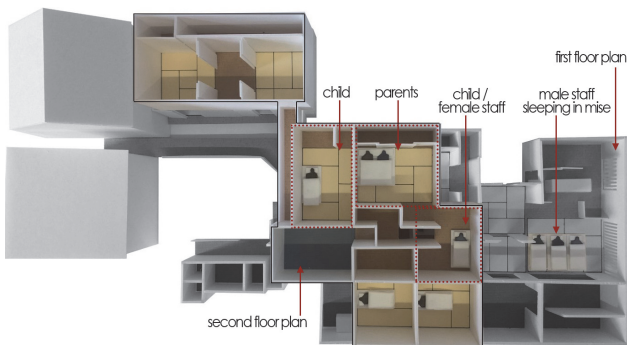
Second floor study model of Hatake House depicting the sleeping order. (Source: Author)
